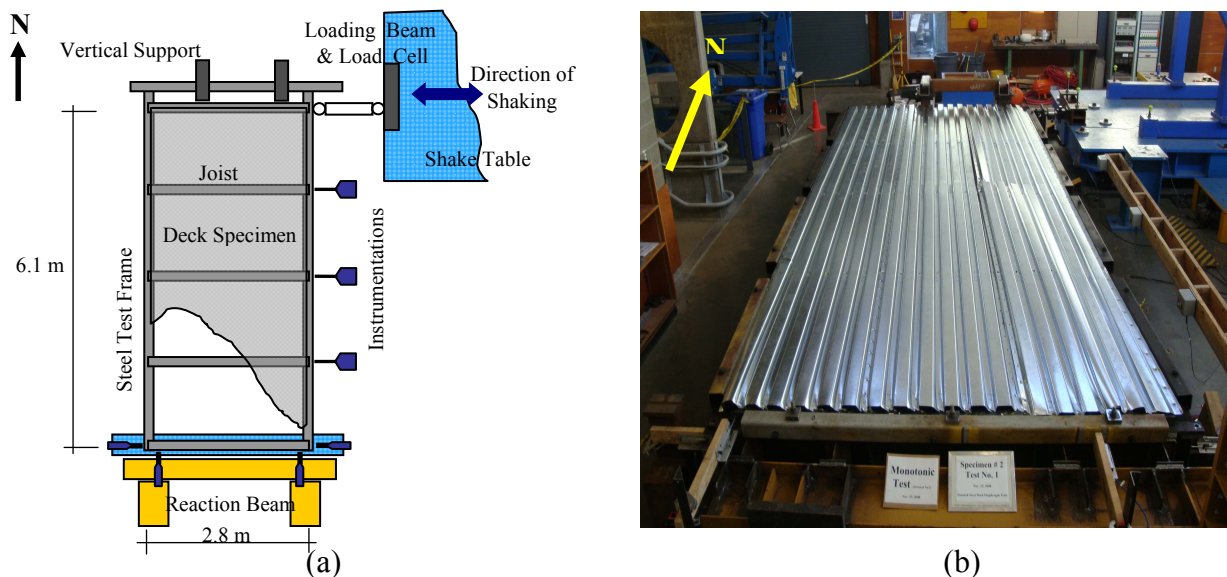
Steel Diaphragm test set-up: a) Schematic plan view and instrumentation layout; b) General view.
